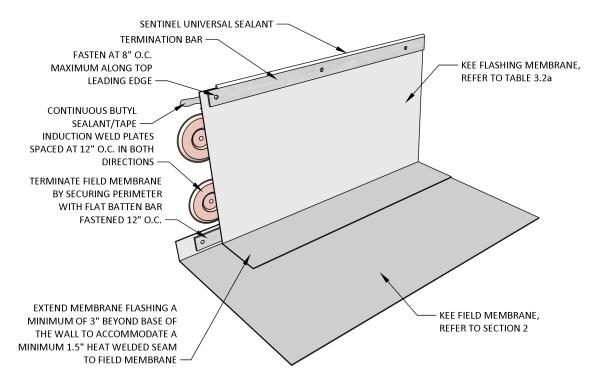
Induction Welded KEE Flashing Membrane at Wall/Curb with Vertical Perimeter Fastening
